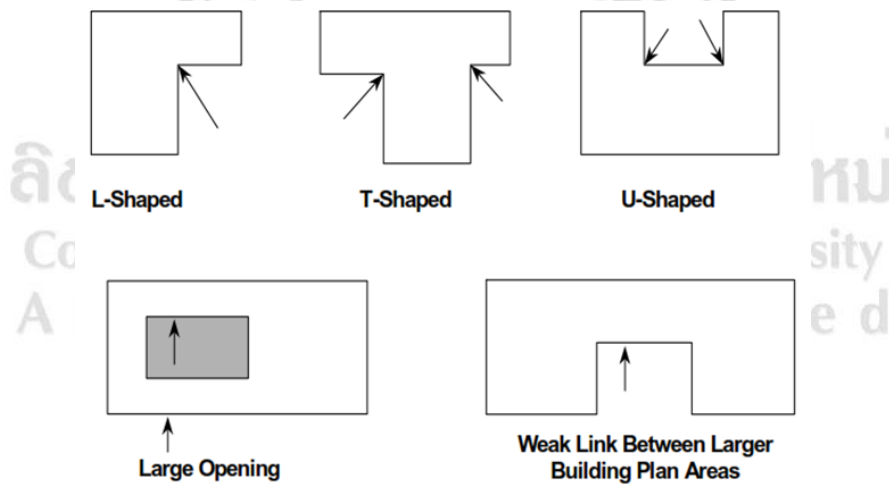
Plan views of various building configurations showing plan irregularities; arrows indicate possible areas of damage (FEMA 154, 2002)
